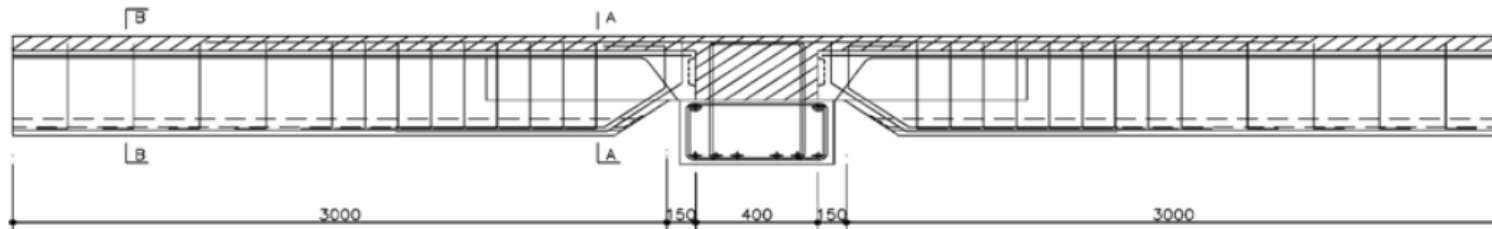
Sections of Double Tee Specimens (Yu. (2008) )
